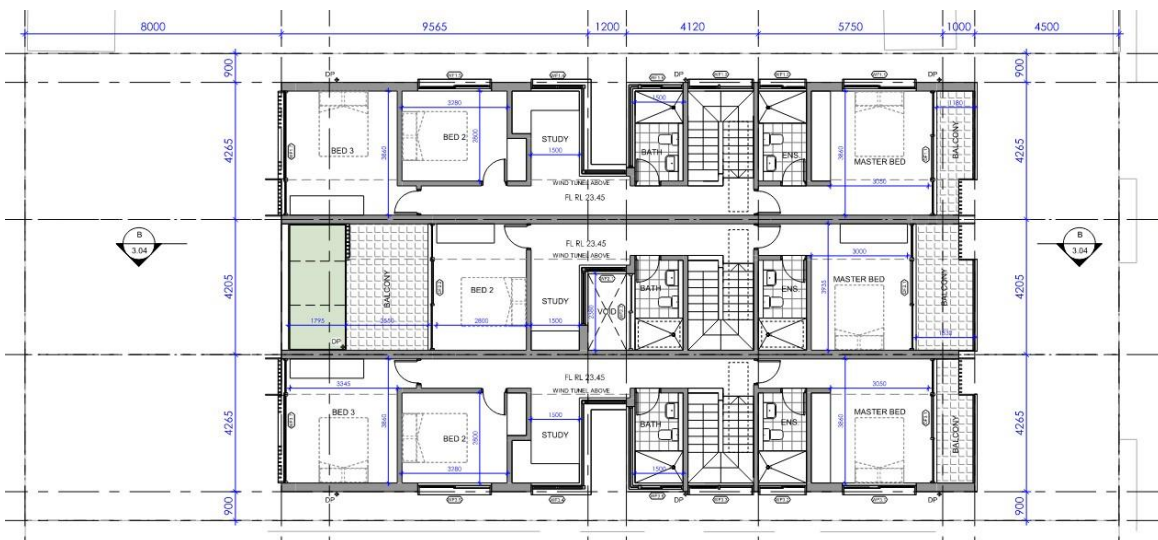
Proposed 1st floor plan (Source: Bryan Long Group)
